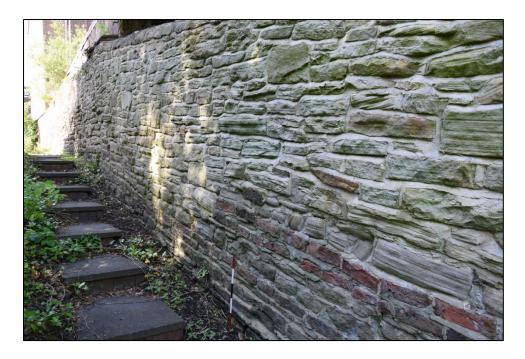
Wall E, east face. This irregular masonry matches that on the west face; compare with Photo 95, above
